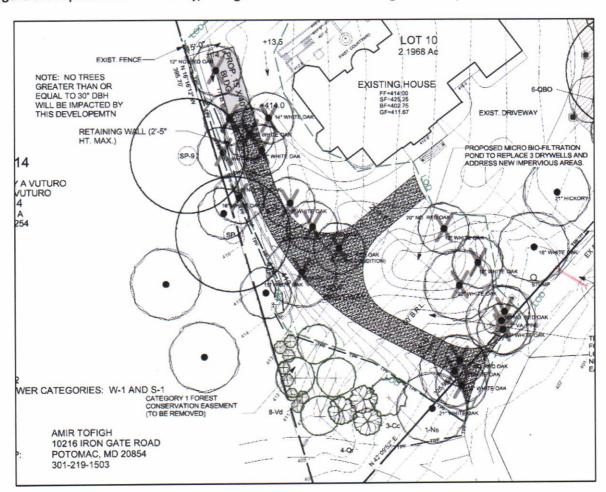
Proposed New Driveway, Garage and Stormwater Management Improvements
